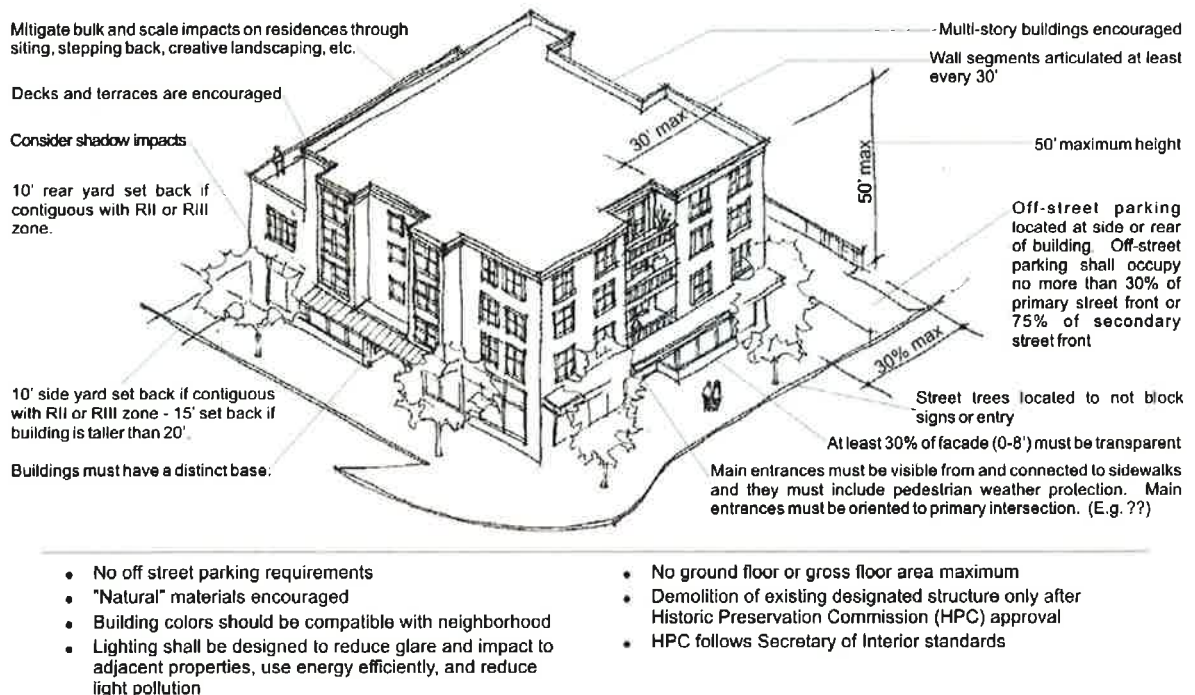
Design guidelines and standards can help achieve objectives such as protection of privacy, pedestrian orientation, impact reduction, building and landscaping quality, and architectural compatibility.
